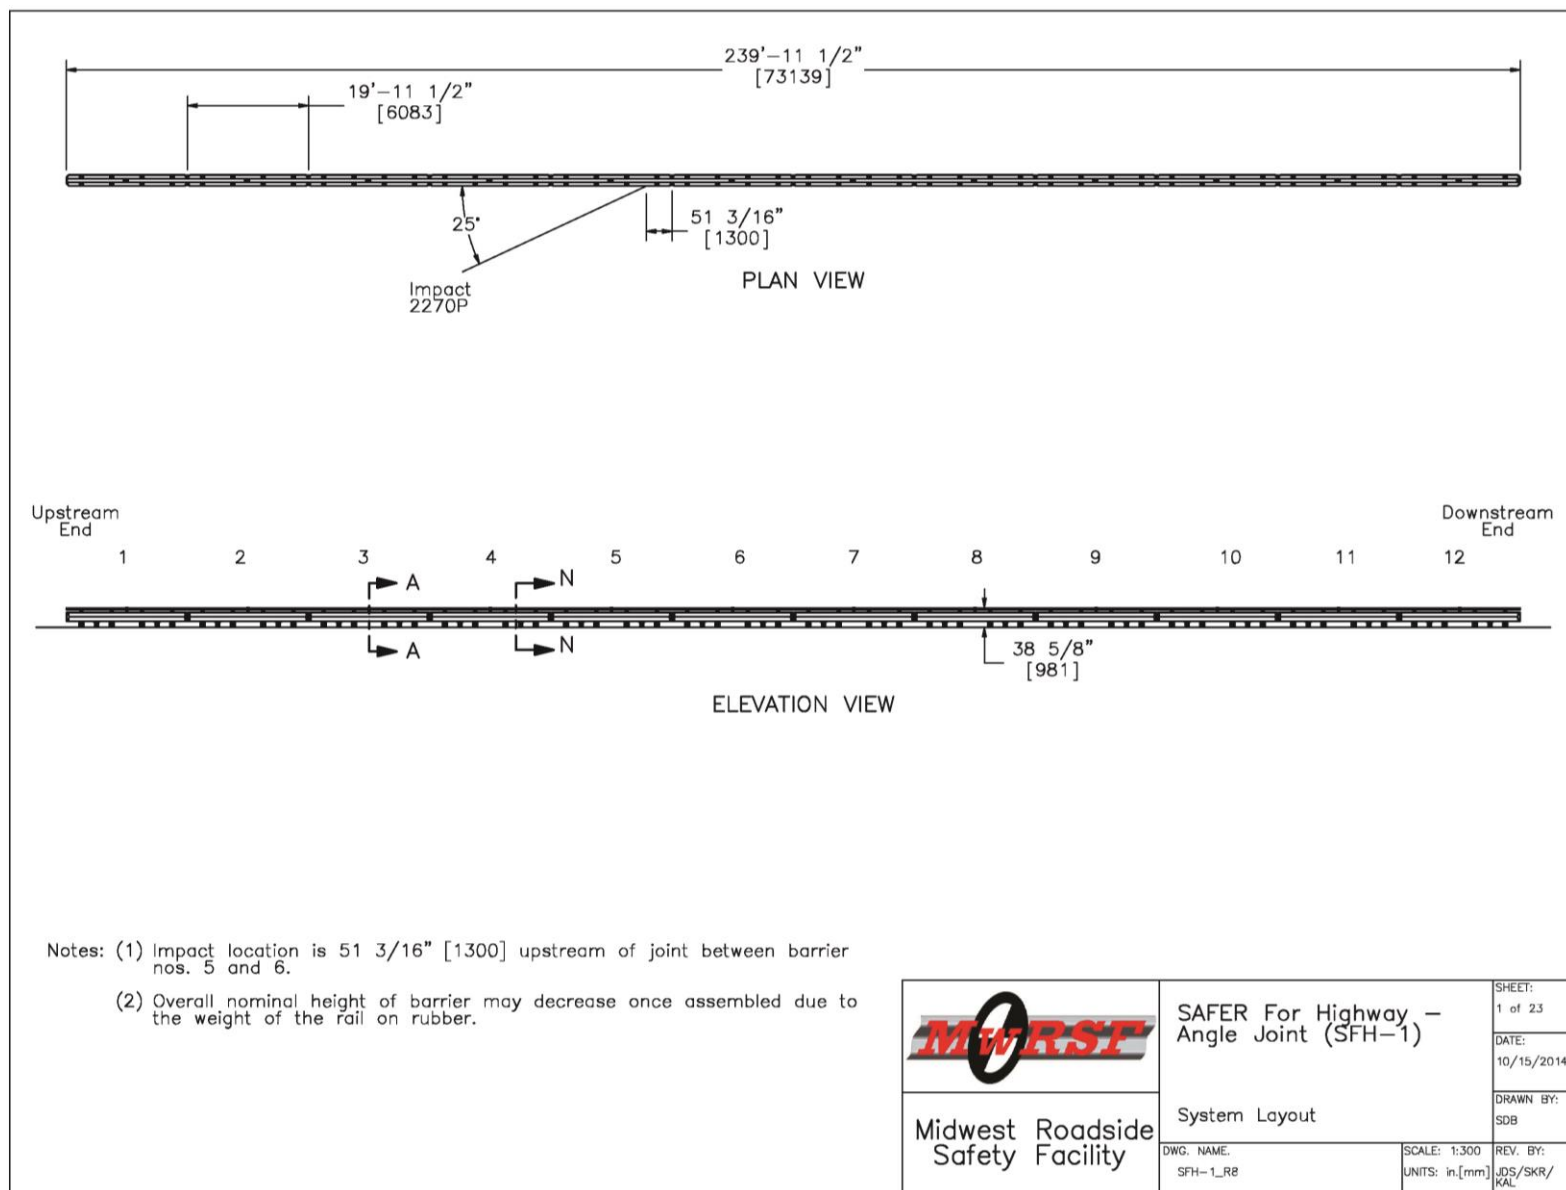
Recommended Barrier Design for Full-Scale Crash Testing, System Layout
